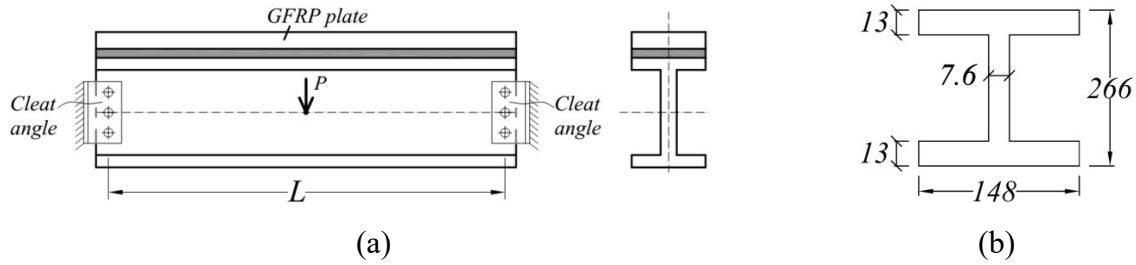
Simply supported beams under a point load (a) beam profile and cross-section and (b) dimensions of W250x45 section
